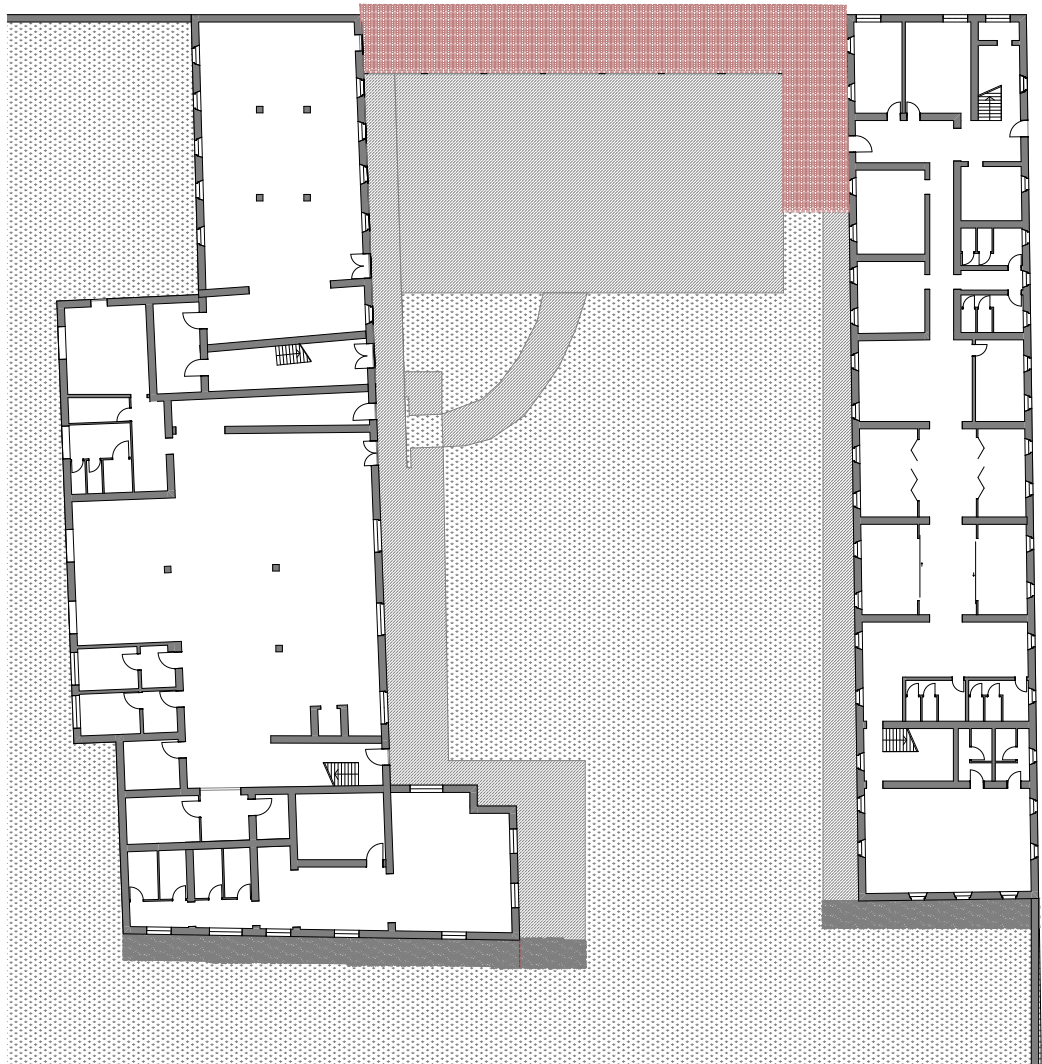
Ground floor plan of Sisters' House I,II, Laundry room, project.
